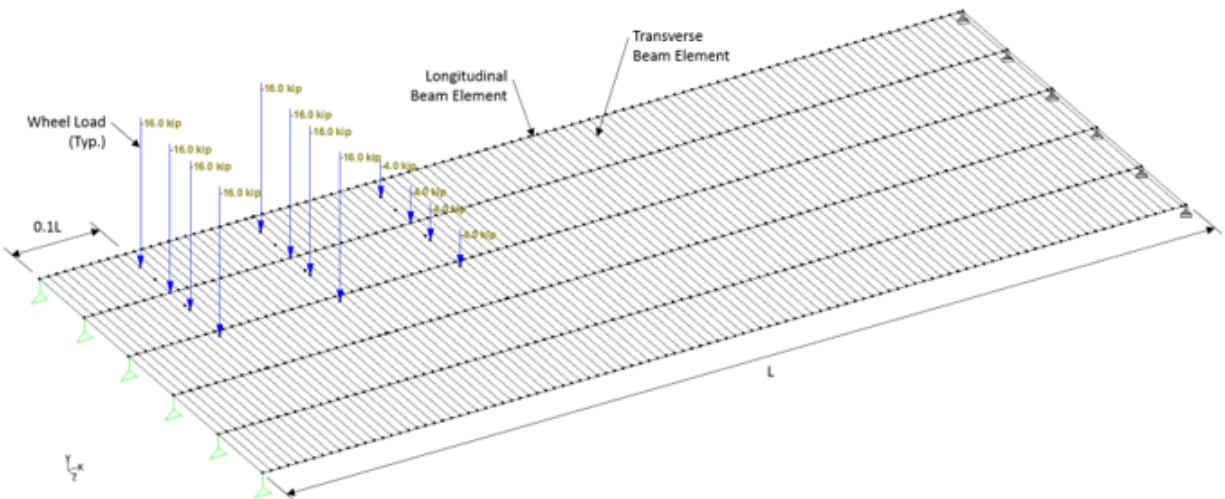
Typical Grillage Model Loading Configuration for Two Lanes
